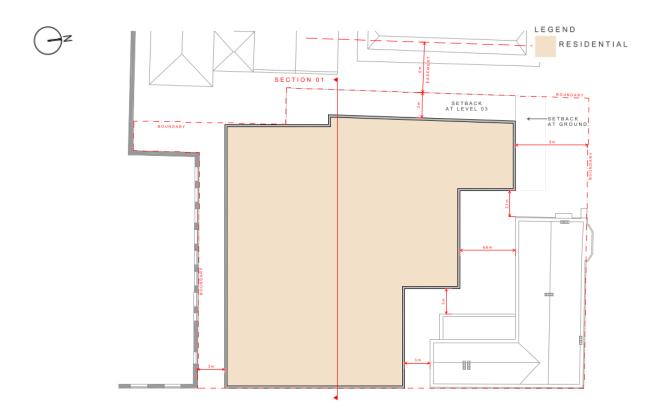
Proposed maximum envelope plan of levels 3 to 5
